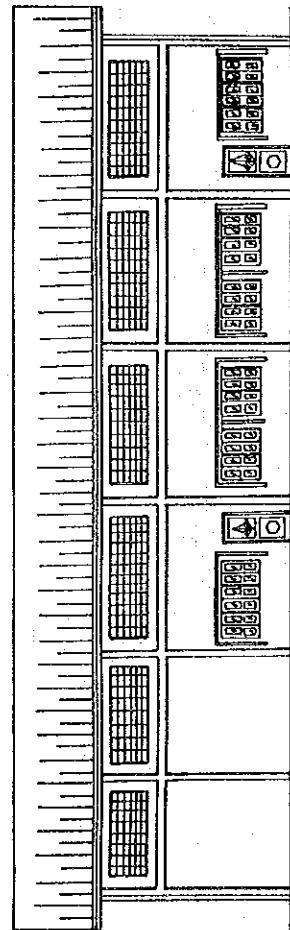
Plan of Buildings for Maintenance Shop
